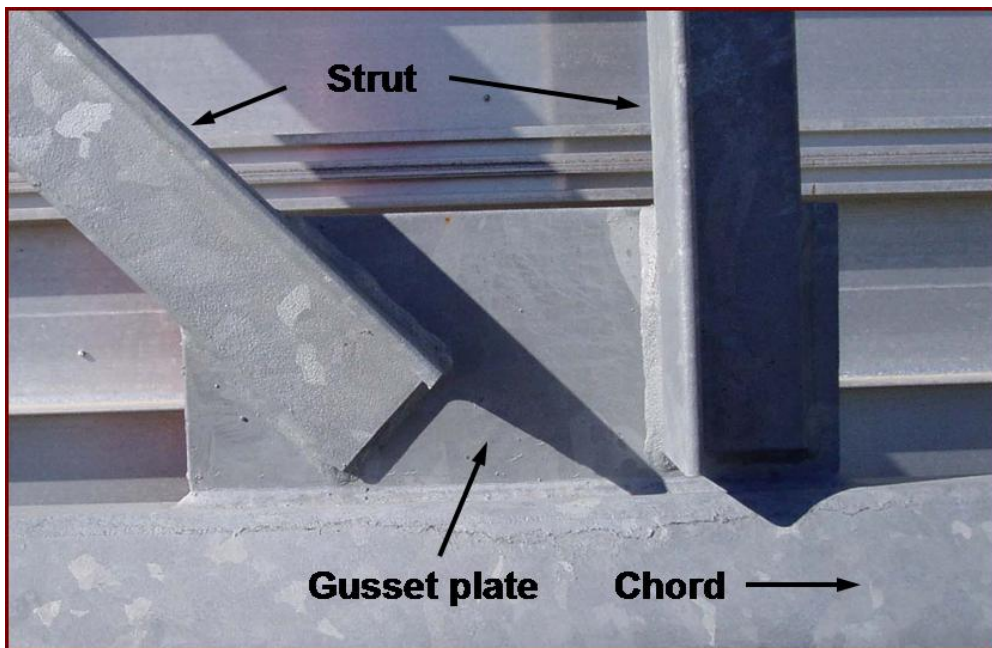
Strut to gusset plate weld connection and gusset plate to chord weld connection.
